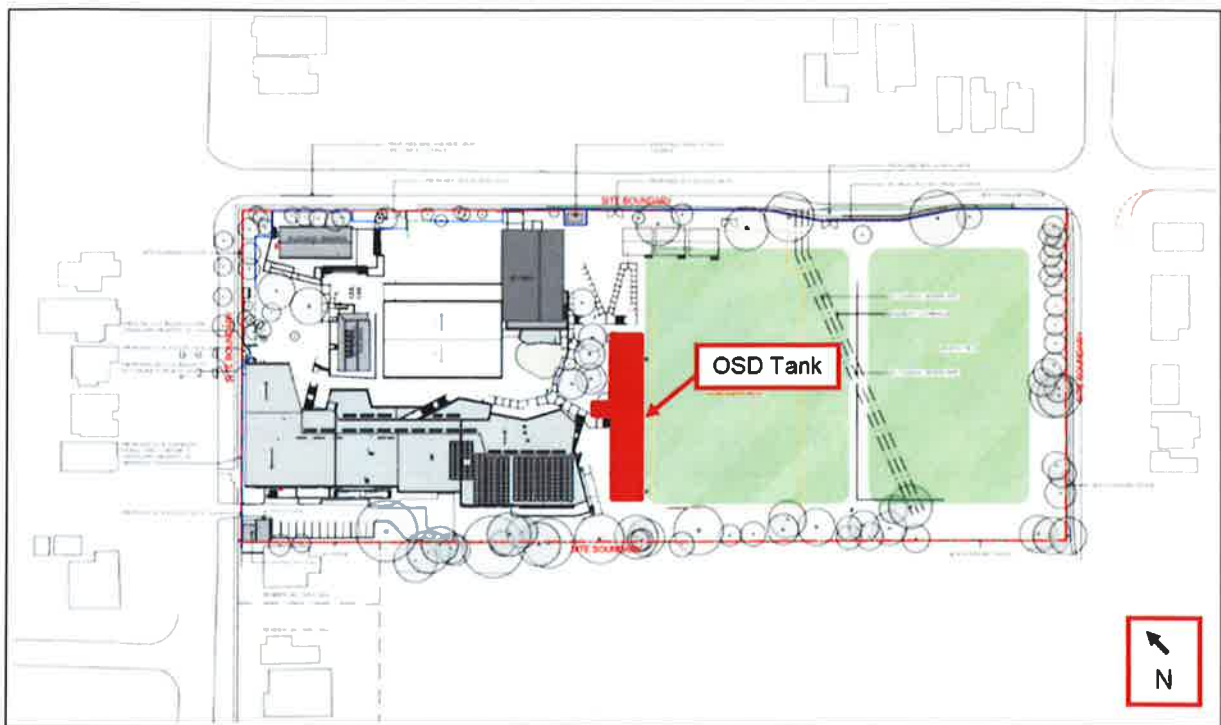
| Proposed OSD tank on the approved plan (Base source: Applicant's Modification Application 2019)
